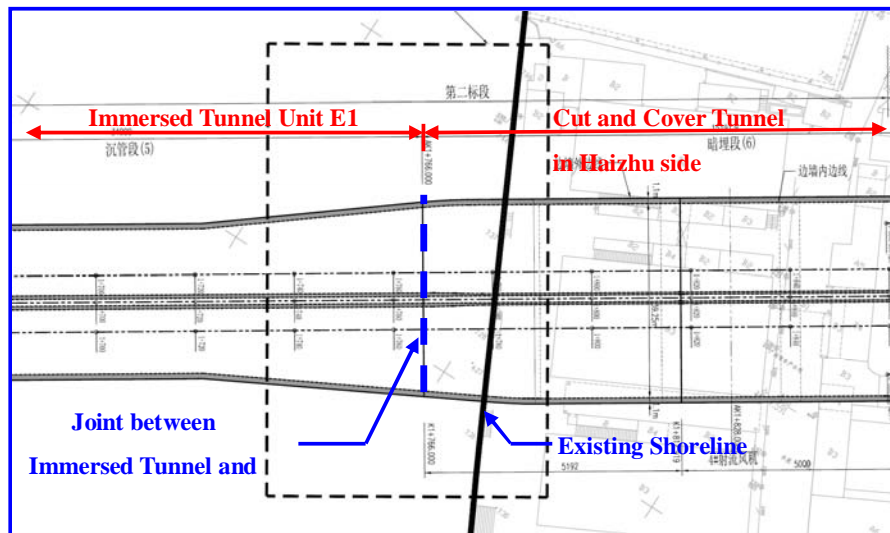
Arrangement of immersed tunnel and cut and cover tunnel in Haizhu side
